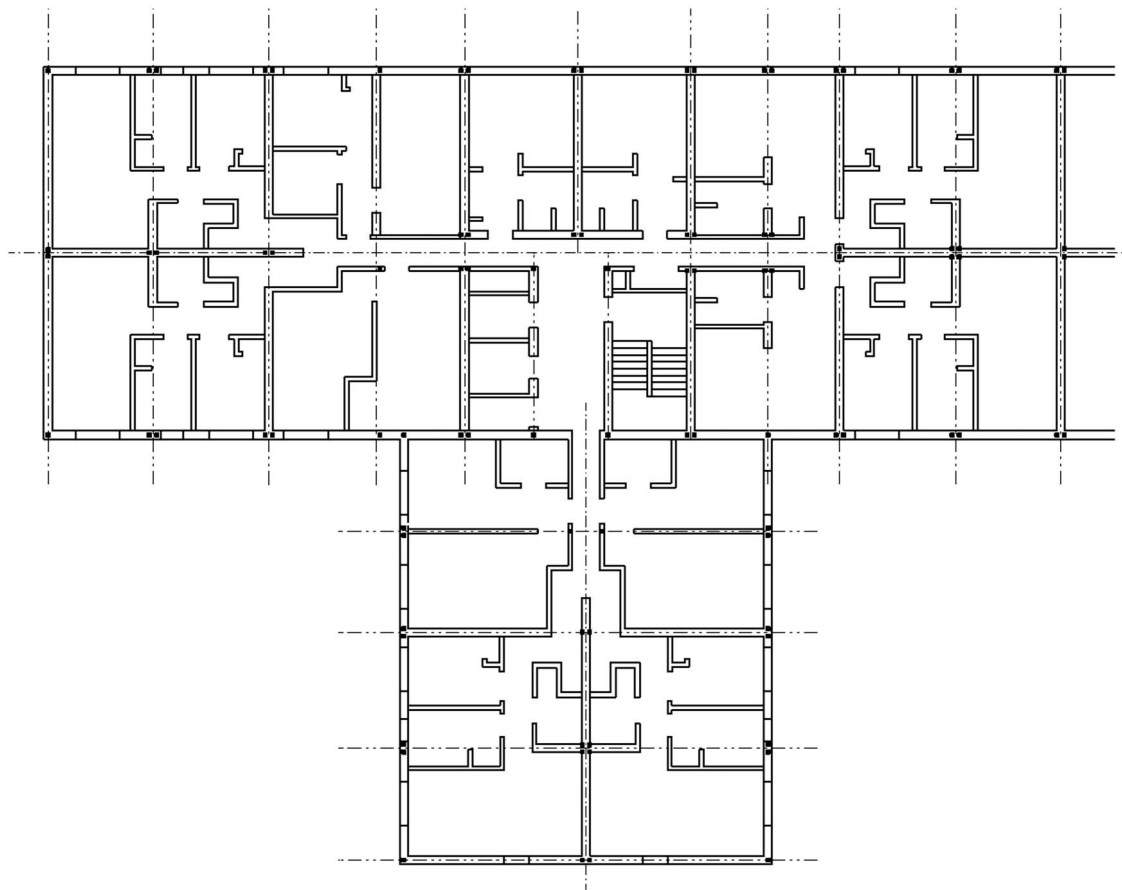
17-story modular building stabilized by a concrete core (image by R. M. Lawson)
